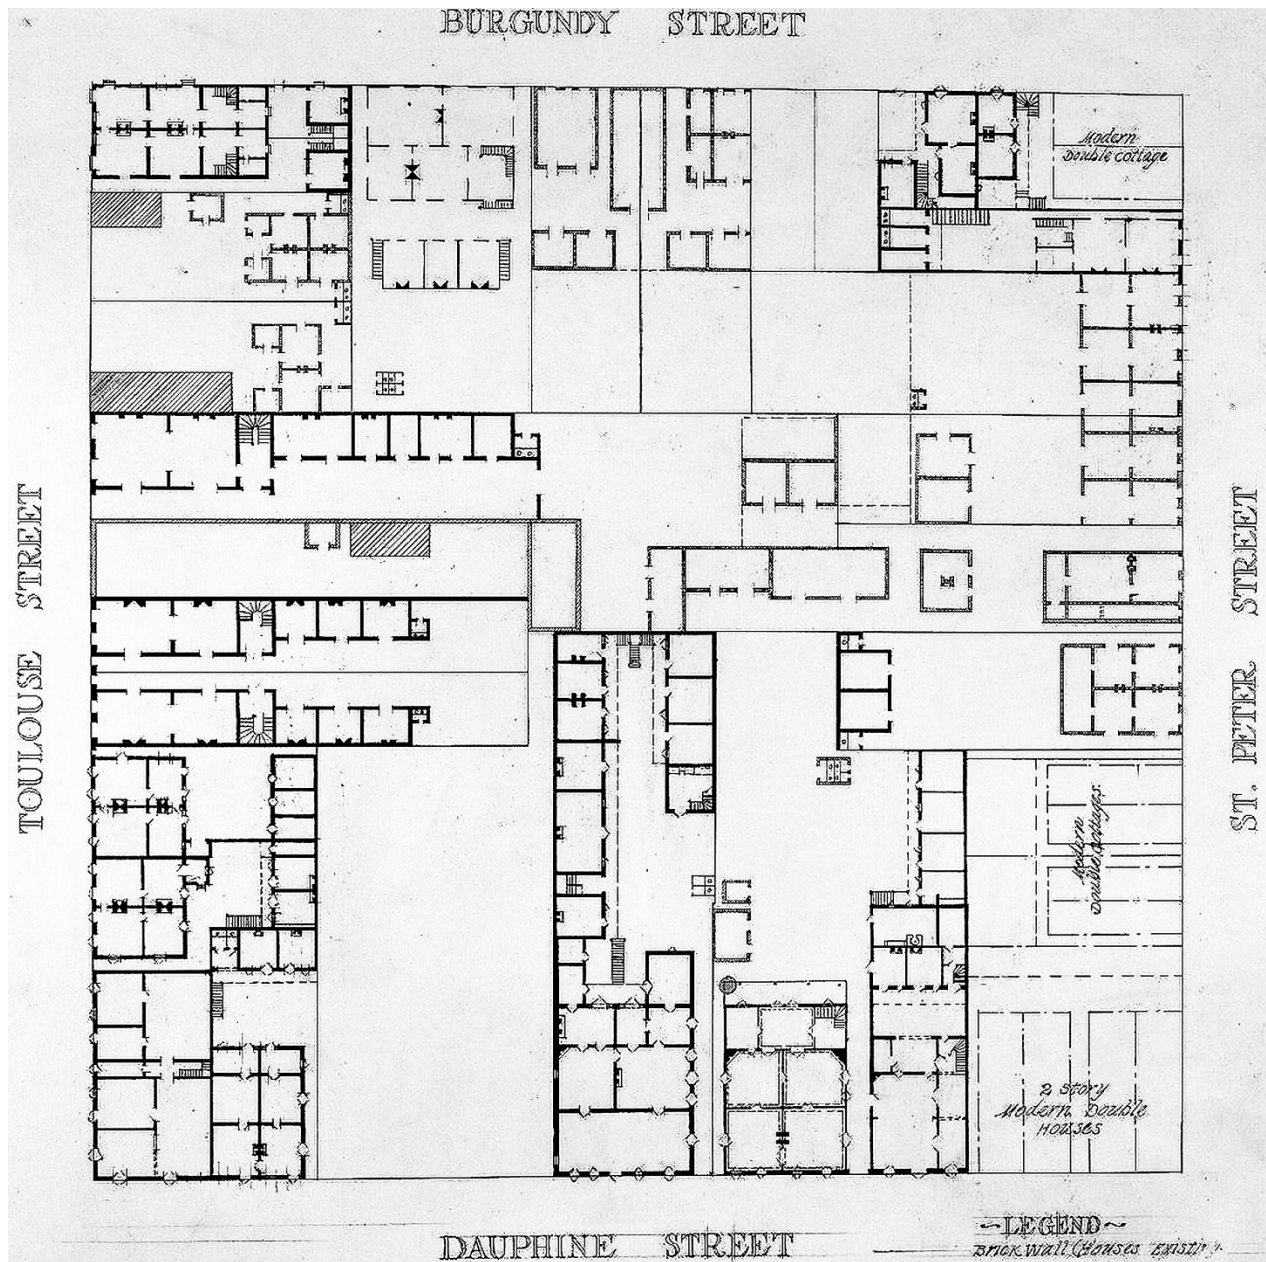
A Historic American Building Survey of the plans of the historic buildings in Square 89, ca. 1940. The two Barthelemy Campenel cottages are the third and fourth houses above the lower left corner on Toulouse Street. They both have semi-double plans. The Arsène Latour *atalier*, is at 625-627 Dauphine Street, slightly right of the middle of the block. It is one of five houses in this square with the Creole Cottage floorplan described by Sam Wilson, Jr. The plan is courtesy the Louisiana History Center of the Louisiana State Museum.
